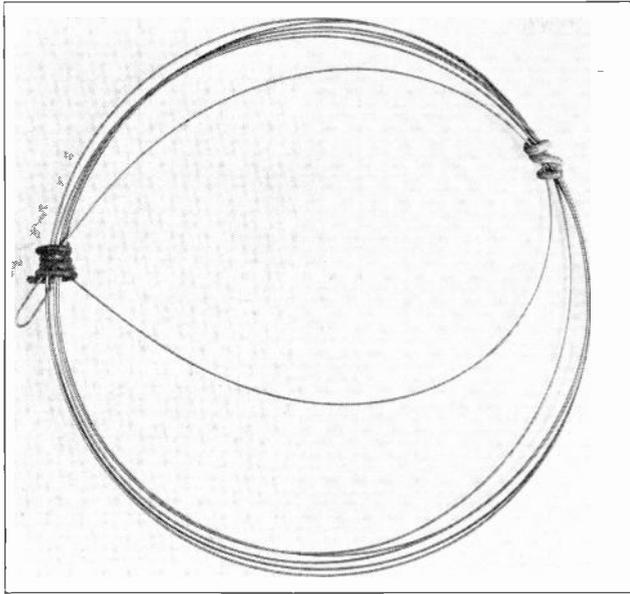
A coil of steel fish tape, such as used for pulling wires into difficult places in a building, or through conduit.
